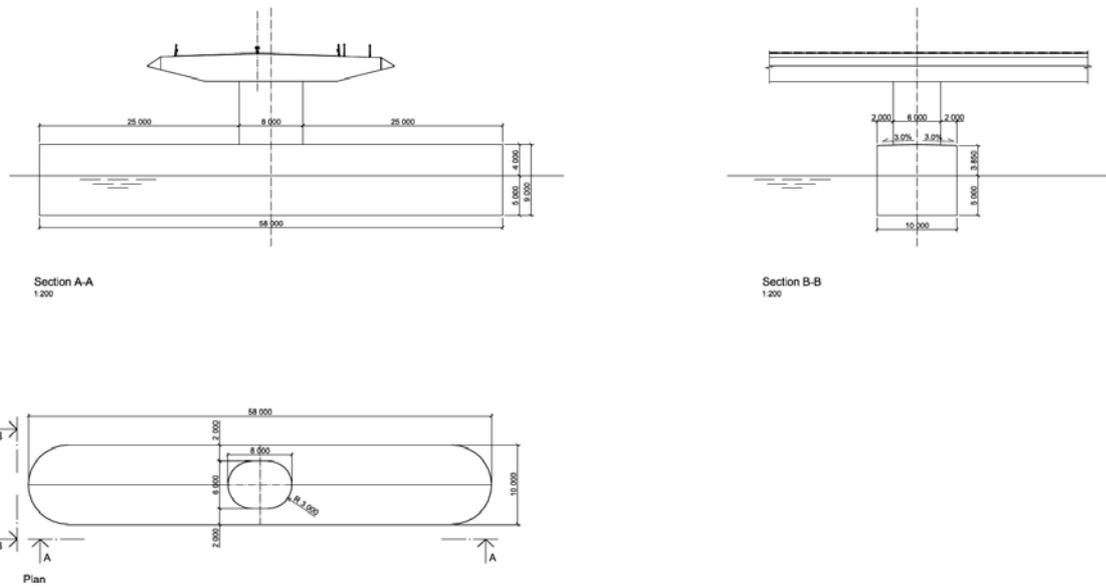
Pontoon global geometry - low bridge. Type 1, -DR-050, ref. Appendix A
